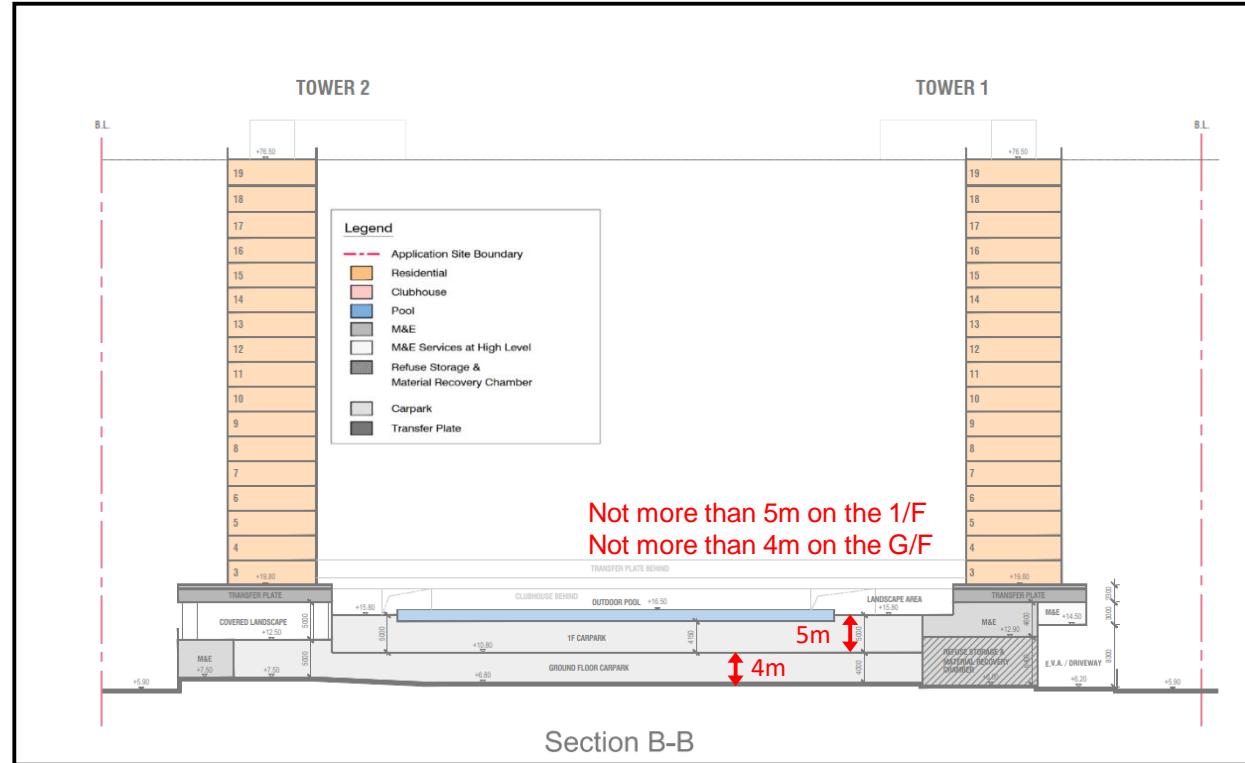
Proposed Building Height for Transfer Plate and M&E Zone Being Reasonable
